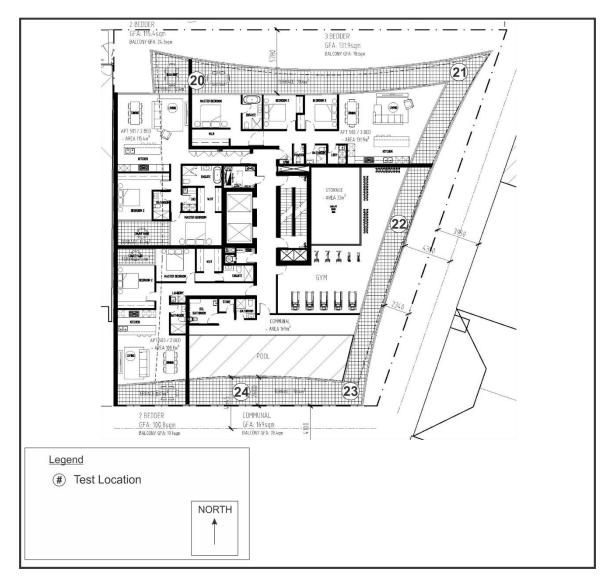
Level 5 Test Locations of the proposed 11-17 Dorcas Street Development for the Proposed Configuration.
